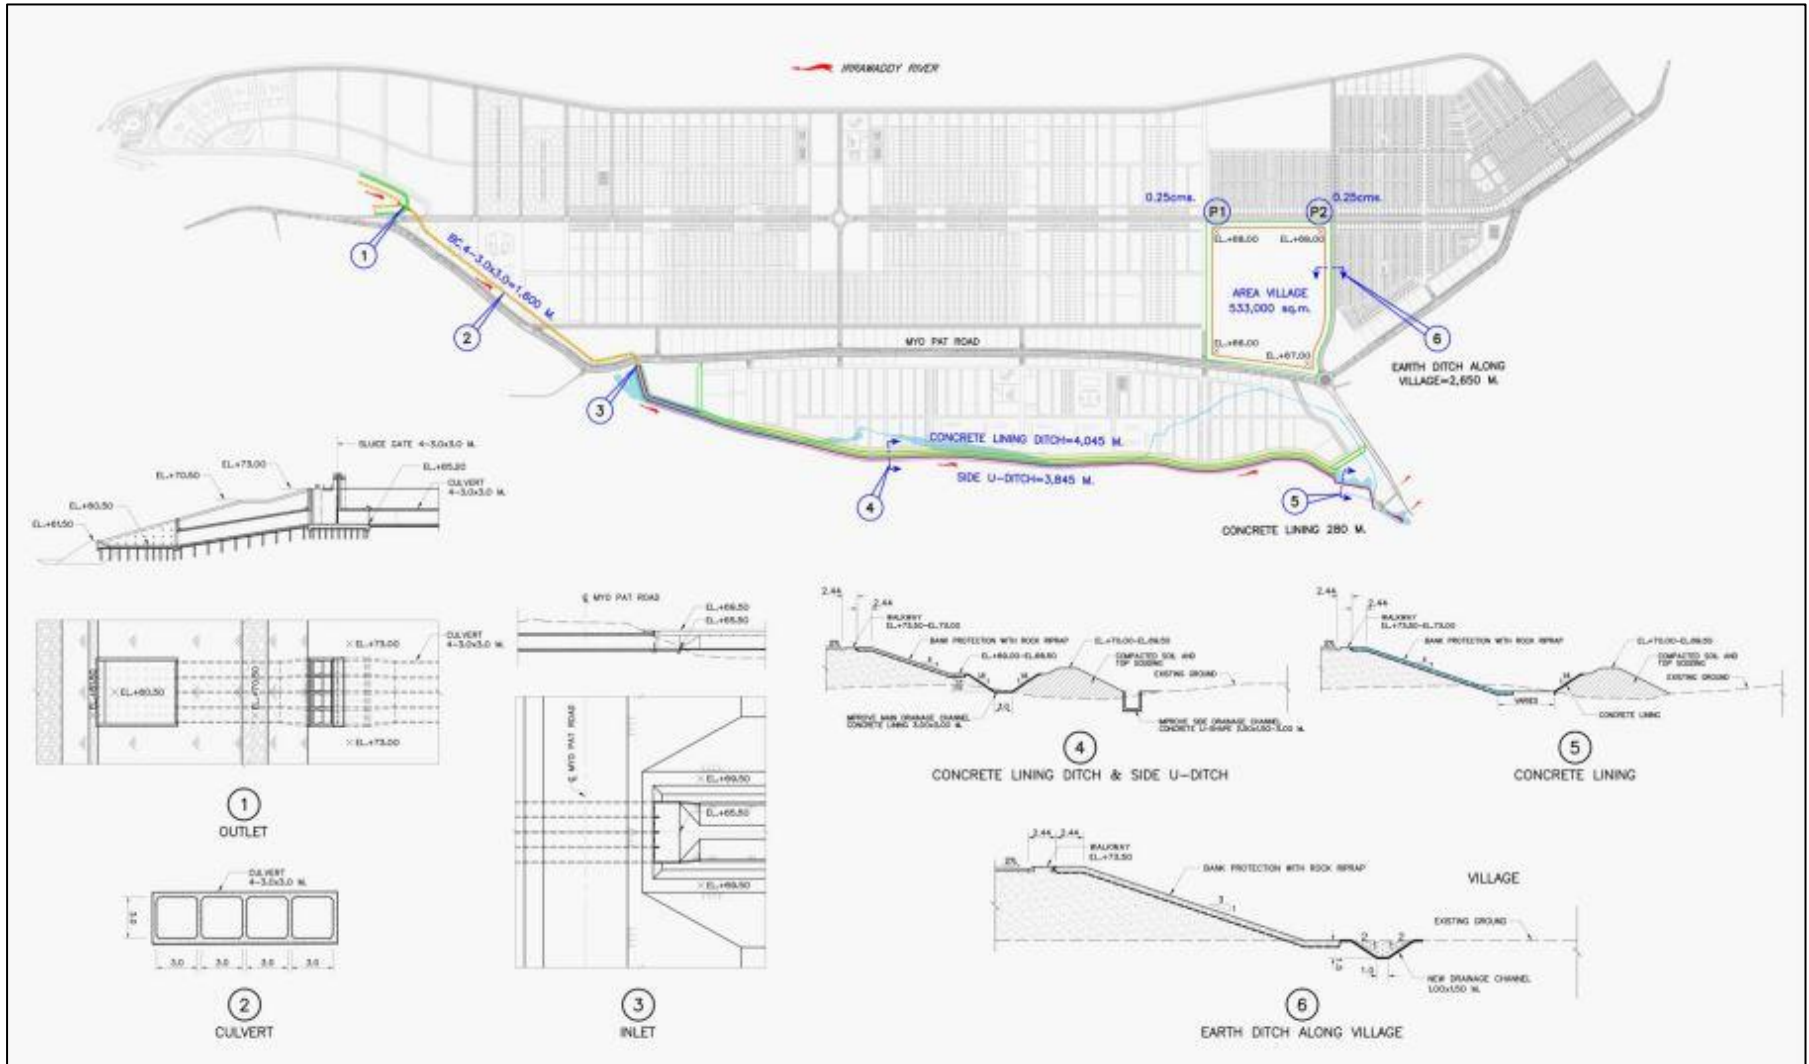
Design Drainage Systems for Outside after Project Development Alternative 2
